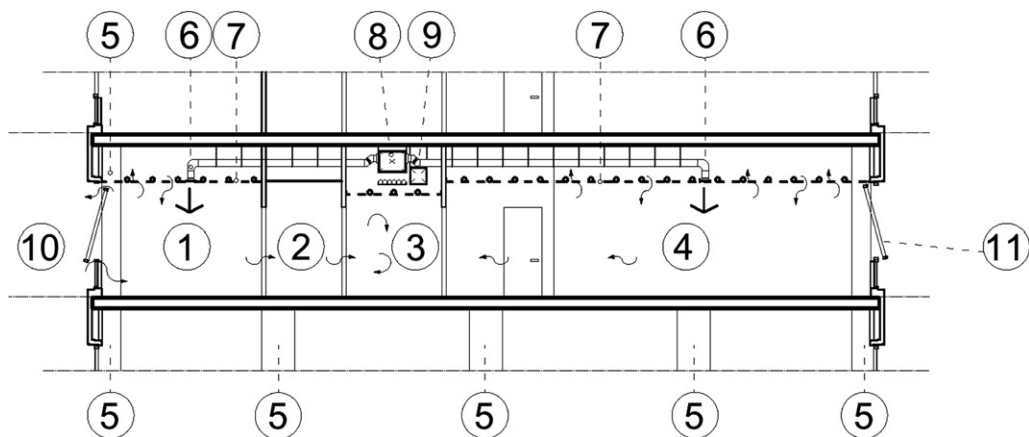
Section through Level 8, as built, a typical ward floor, showing mechanical services and intended ventilation strategy (left-hand window: as built; right-hand, as existing). Key: 1 Single bedroom with centrally controlled mechanical supply and room user operated natural ventilation; 2 Internal storeroom: extract only with grille in doorway to draw in air from wards; 3 Corridor: no extract, warm air from wards dwells; 4 Six bed ward: centrally controlled mechanical supply and room user operated natural ventilation; 5 Concrete structure: piers enable flat slabs with no downstands; 6 Mechanical air supply; 7 Radiant ceiling: perforated metal trays with attached low pressure hot water heating pipes; 8 Main air supply duct; 9 Main services spine; 10 As built window arrangement; 11 Current window arrangement.
